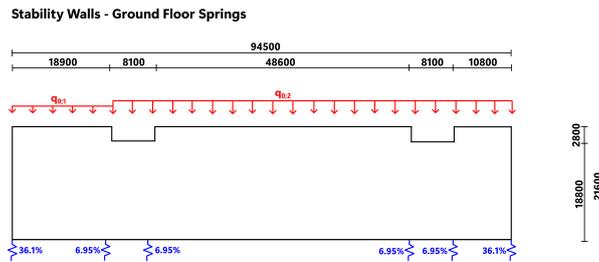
Horizontal Wind Load on Ground Floor Walls
